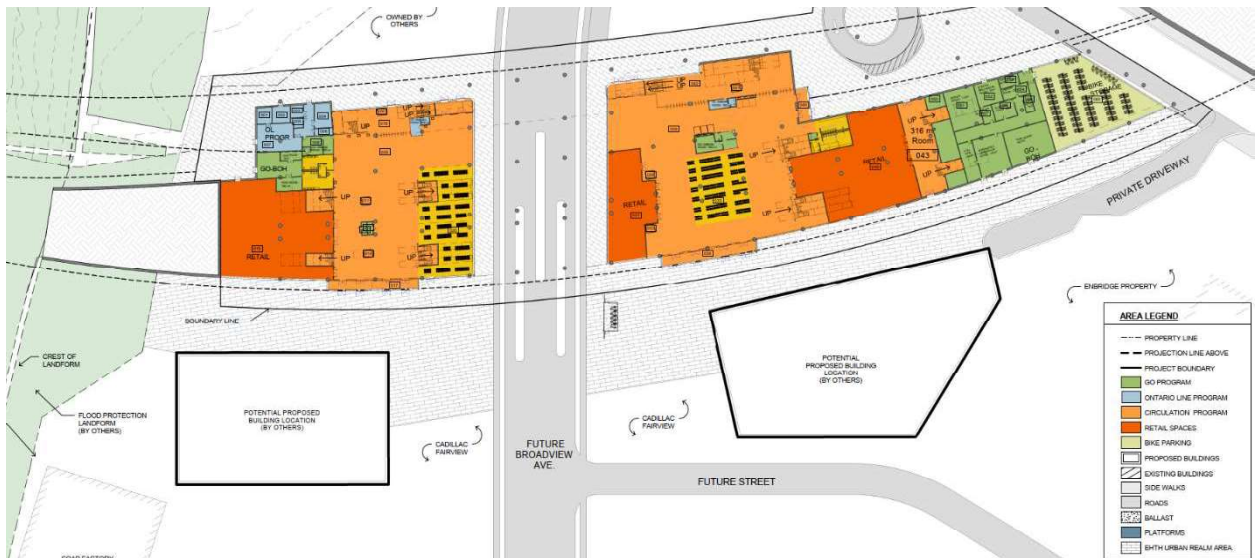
Preliminary Station Site Plan –Concourse Level
